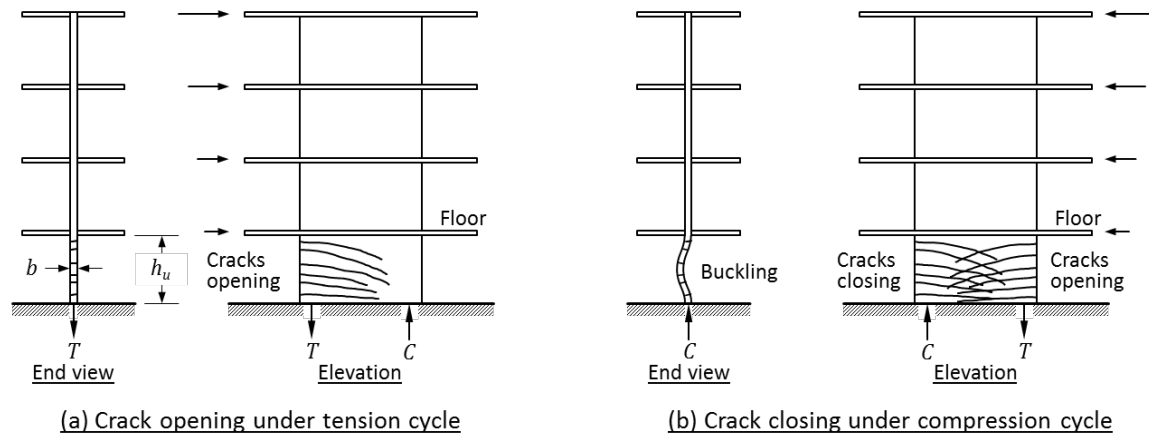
Lateral instability of wall boundary previously yielded in tension (After Chai and Elayer, 1999).
